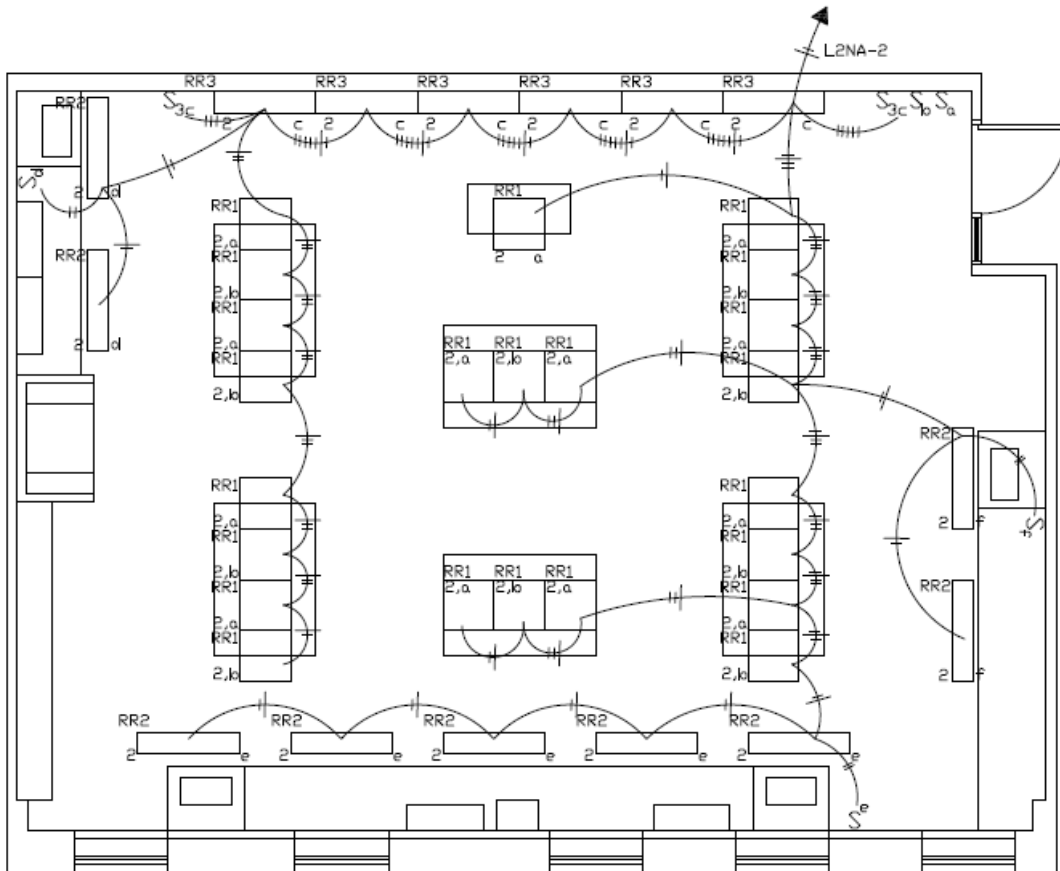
Second Floor Circuiting Plan – Ecology Teaching Lab
